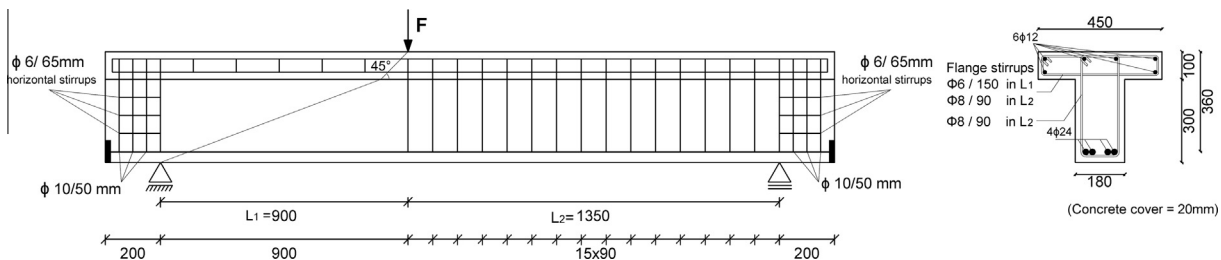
Tested beams: geometry, steel reinforcements applied in all beams (dimensions in mm).
